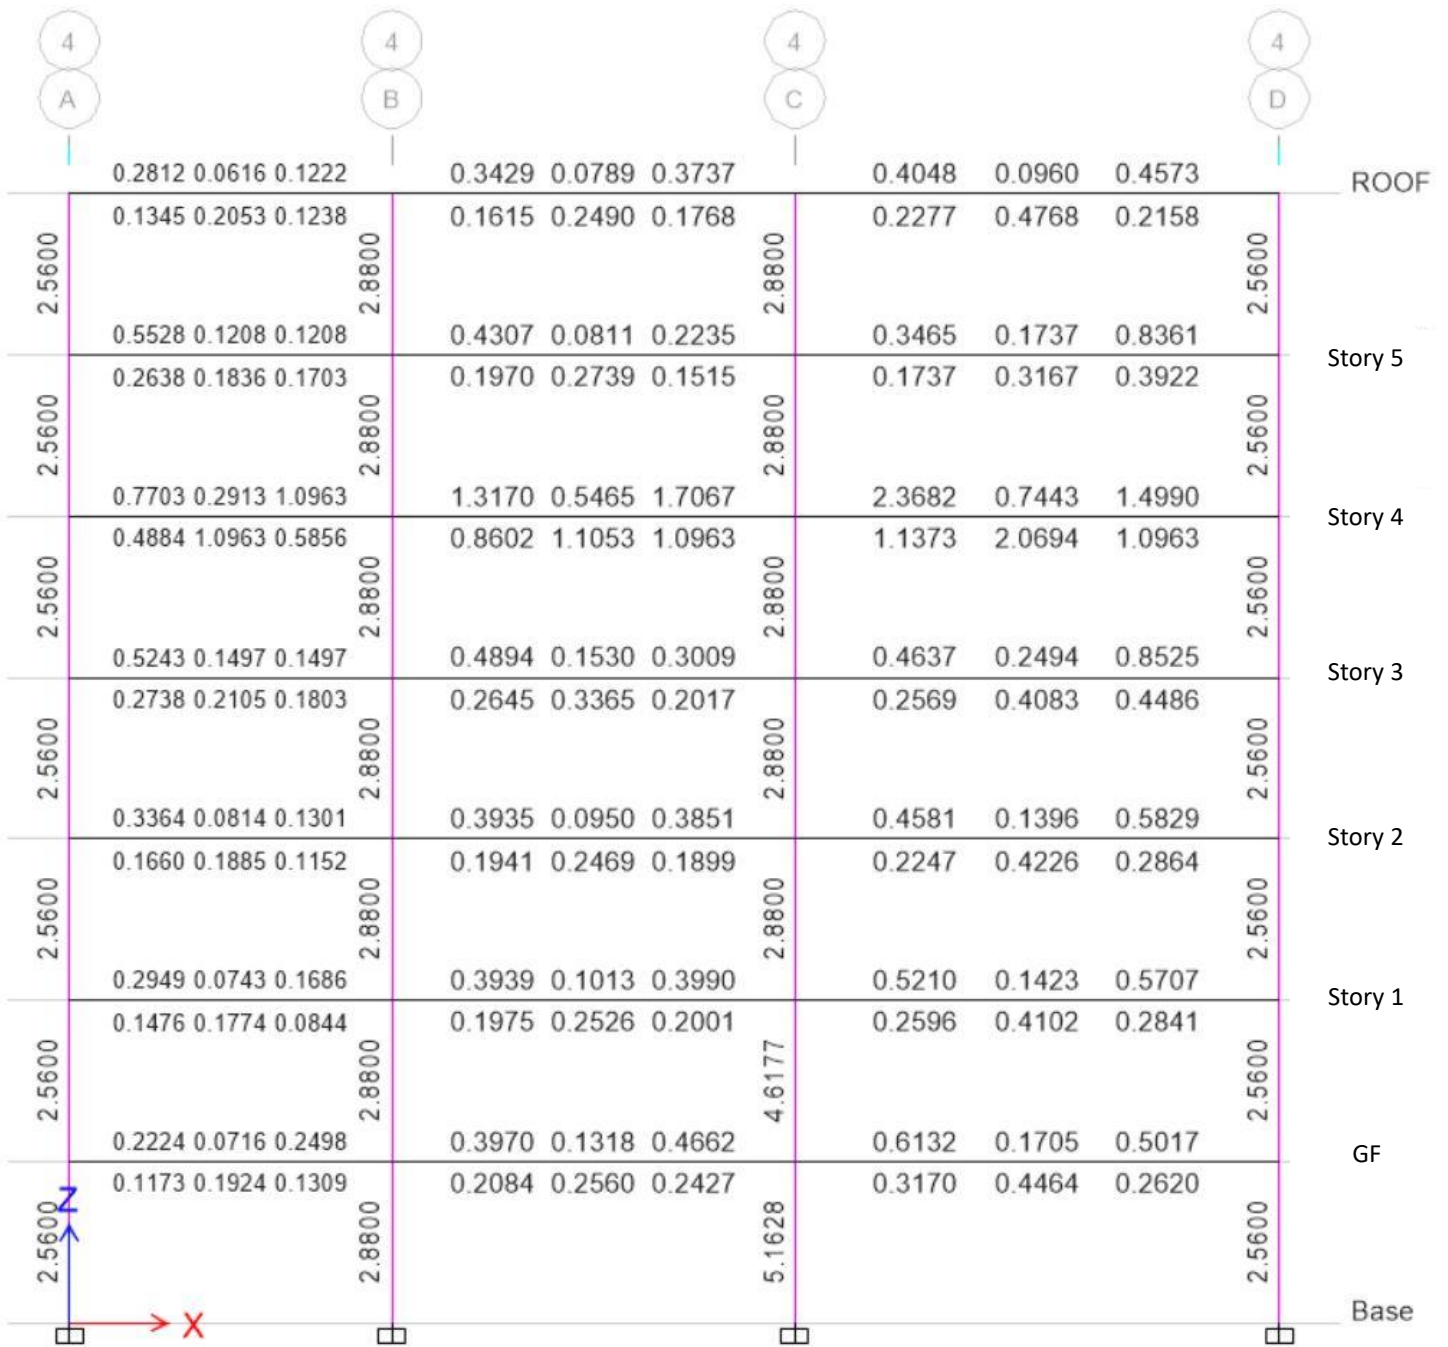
Grid 2 Beam Longitudinal Reinforcement
